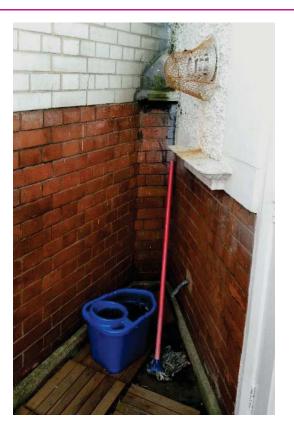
The junction between the boundary wall and the east elevation of The Lodge beside door D2
